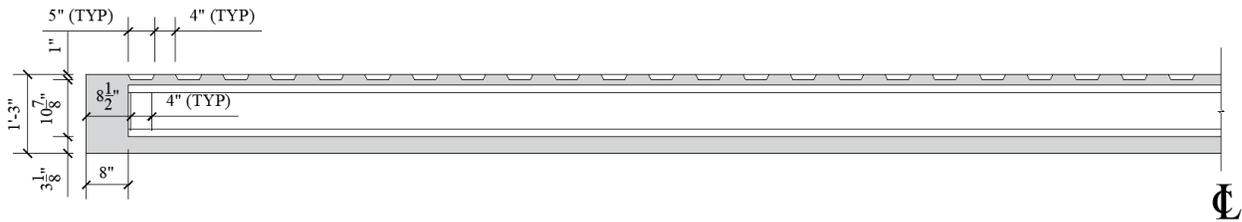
Elevation view of Design B UHPC box beam (A-A section).
